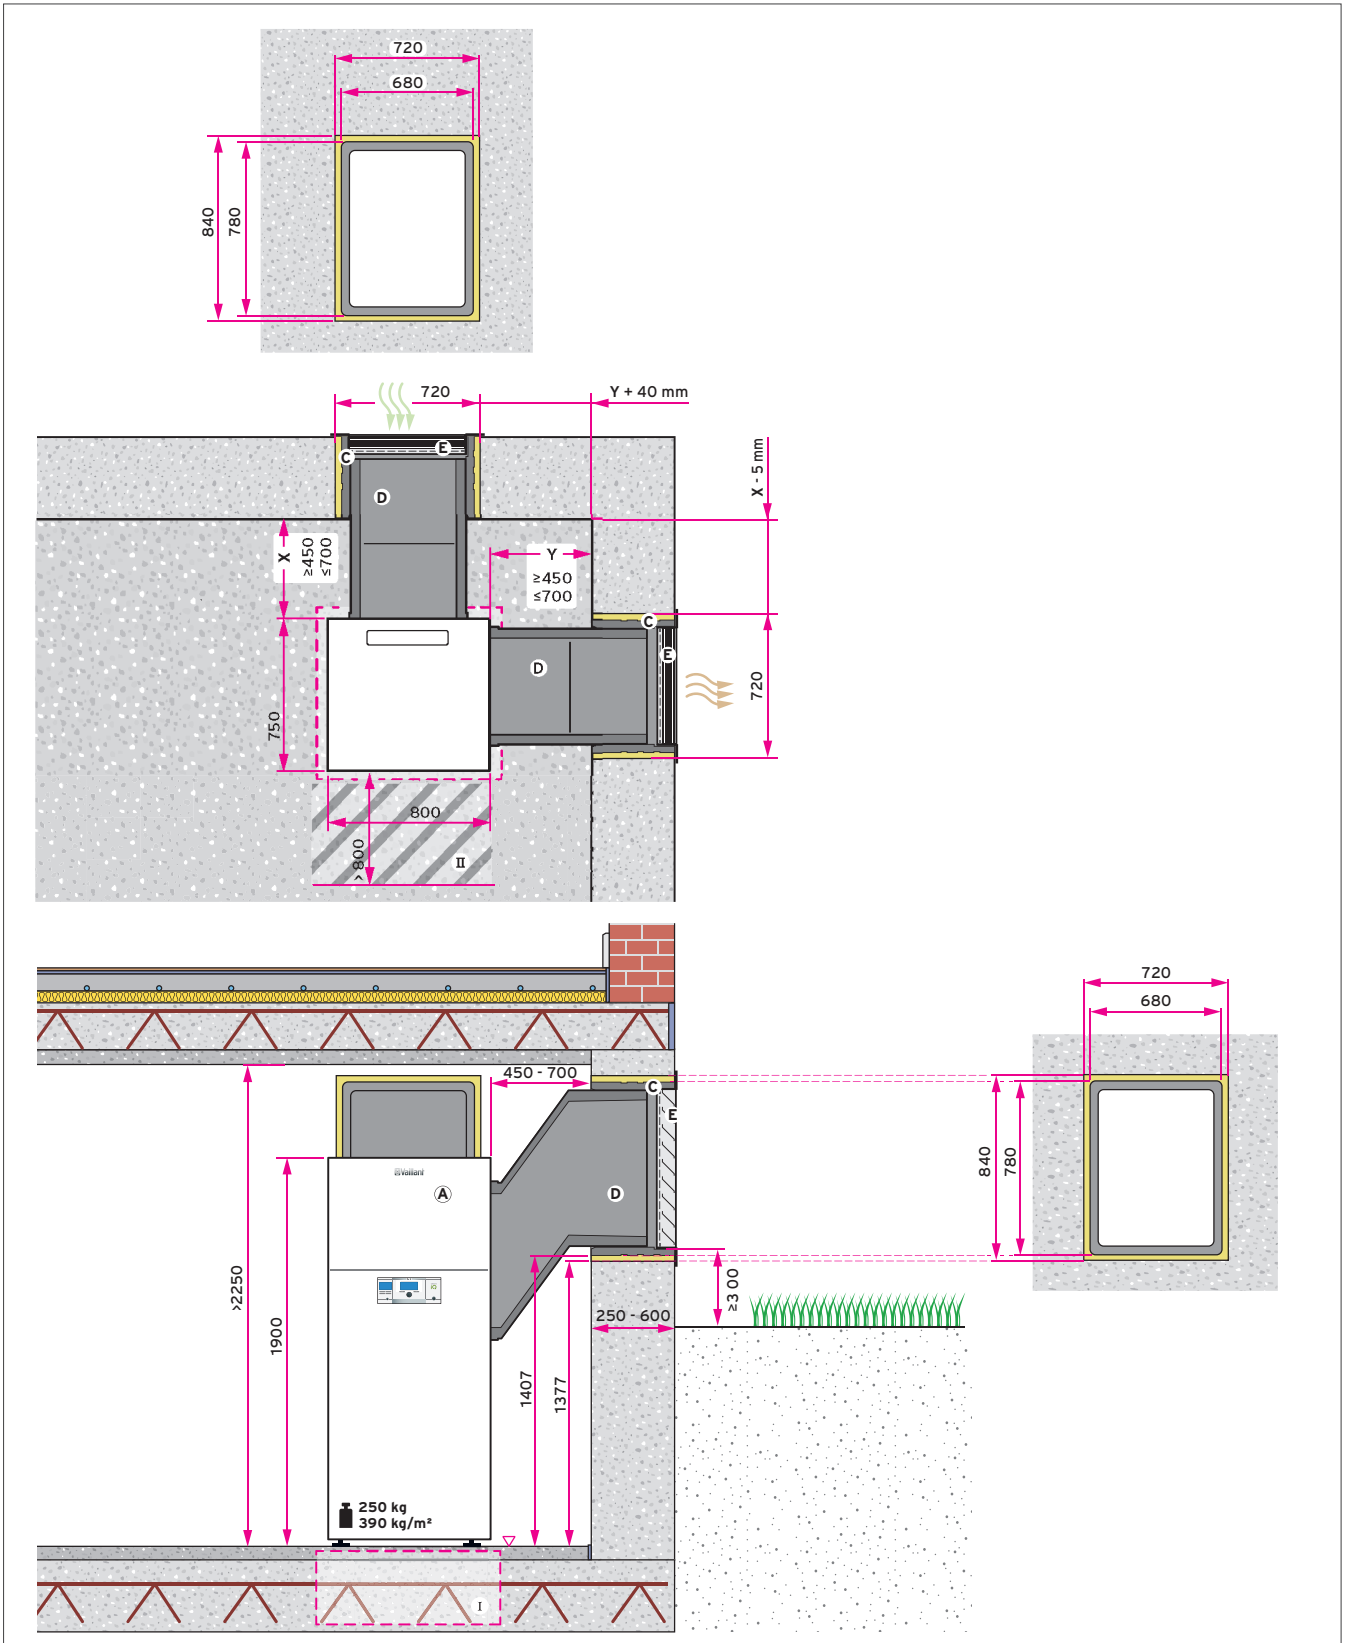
versoTHERM installation situation, ground floor - right-hand installation in the corner of a room with cellar adapter
